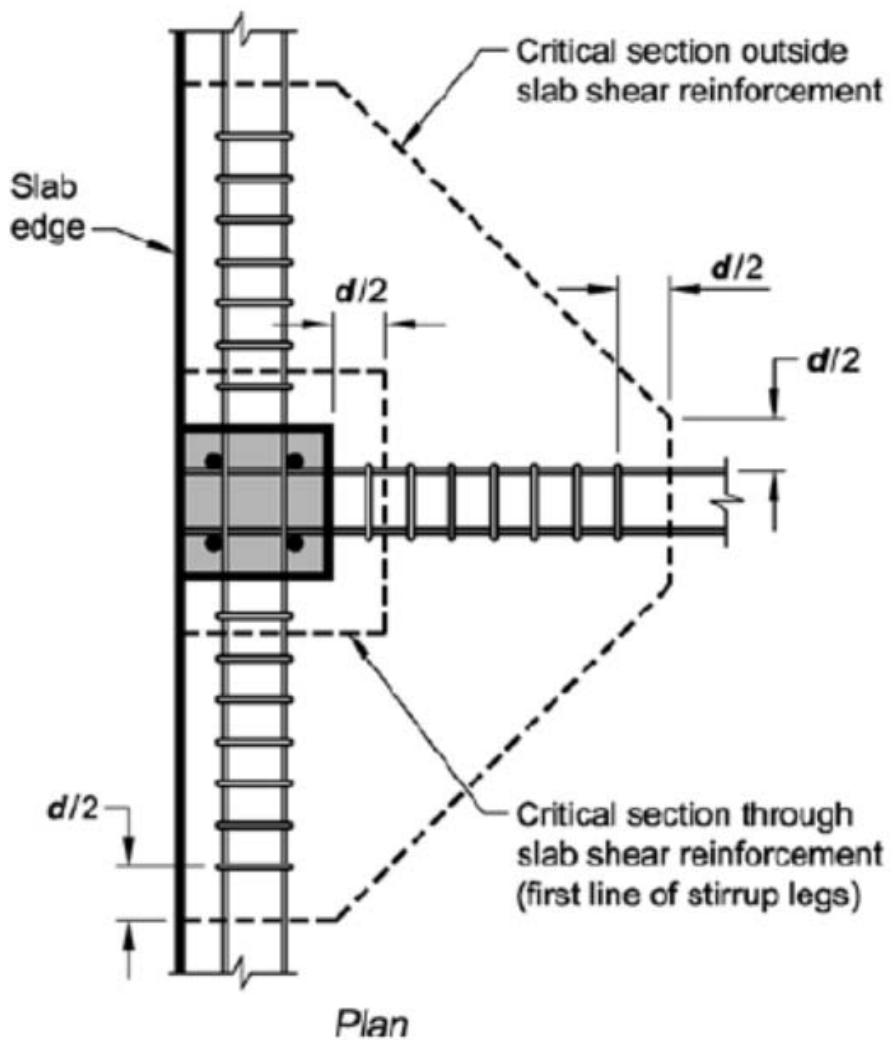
Critical sections for two-way shear in slab with shear reinforcement at edge column.
